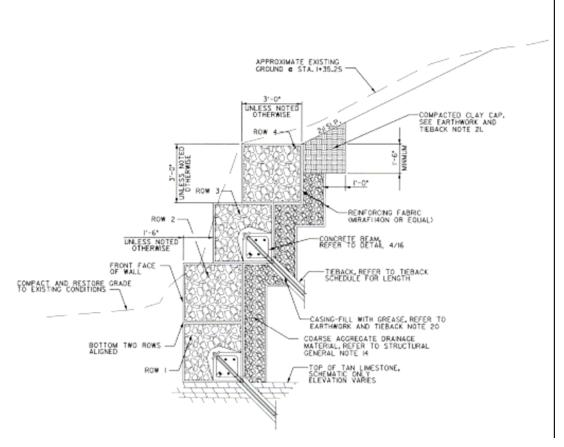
Typical Gabion Wall with Tie-Backs.
